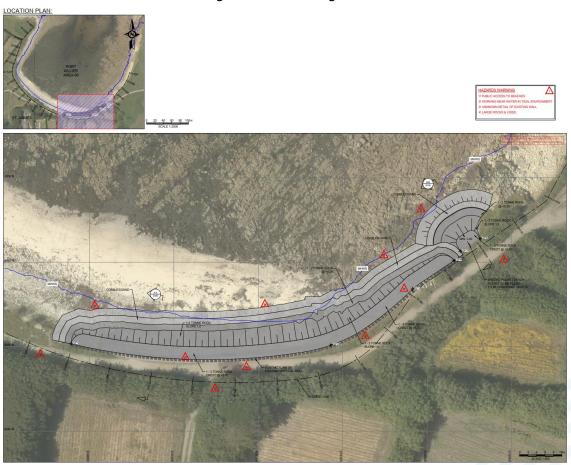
Extent of proposed works at Porth Killier (HR Wallingford, 2022)
